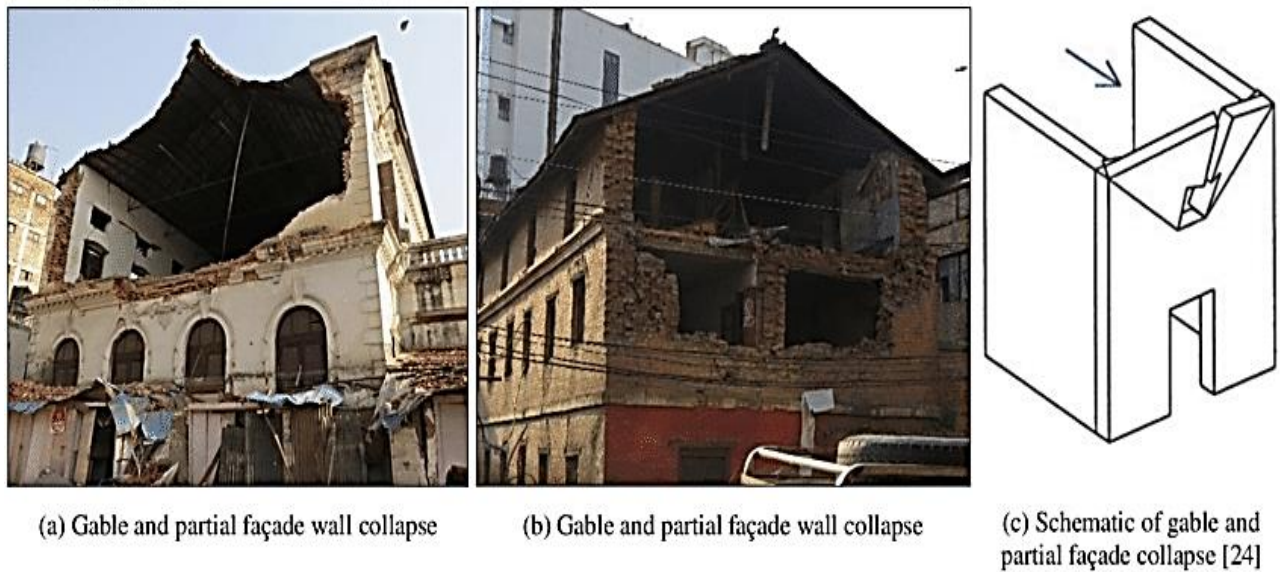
Collapse of gable walls (Dmytro Dizhur et al. , june 2016)
